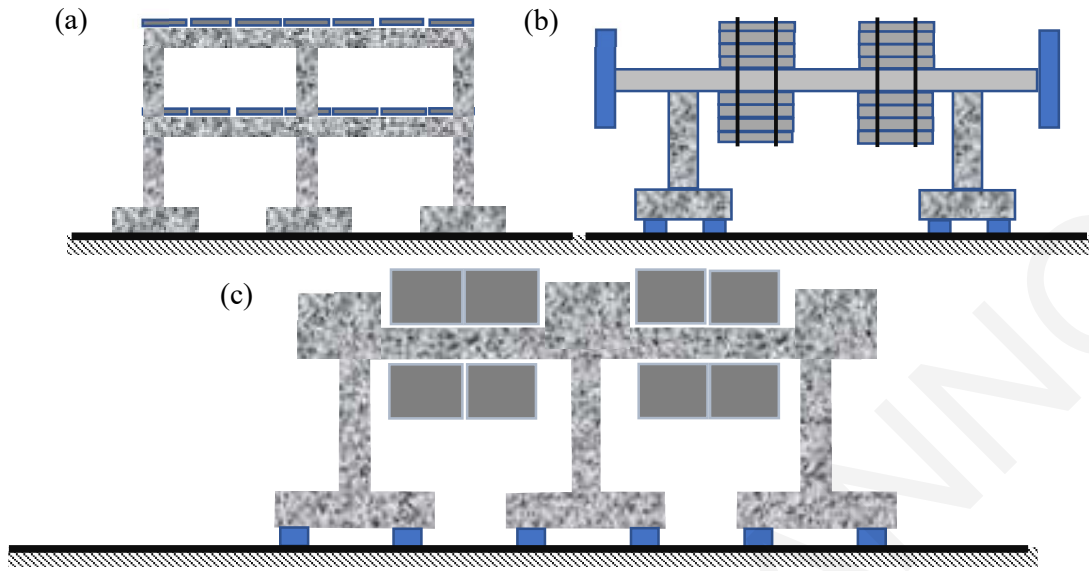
5 : Typical layout of dynamic data base; (a) columns connected with common type beams; (b) columns connected with rigid beams. (Source: [Li et al., 2013](#)); (c) columns connected with rigid beams ([Elwood and Moehle, 2003](#))
